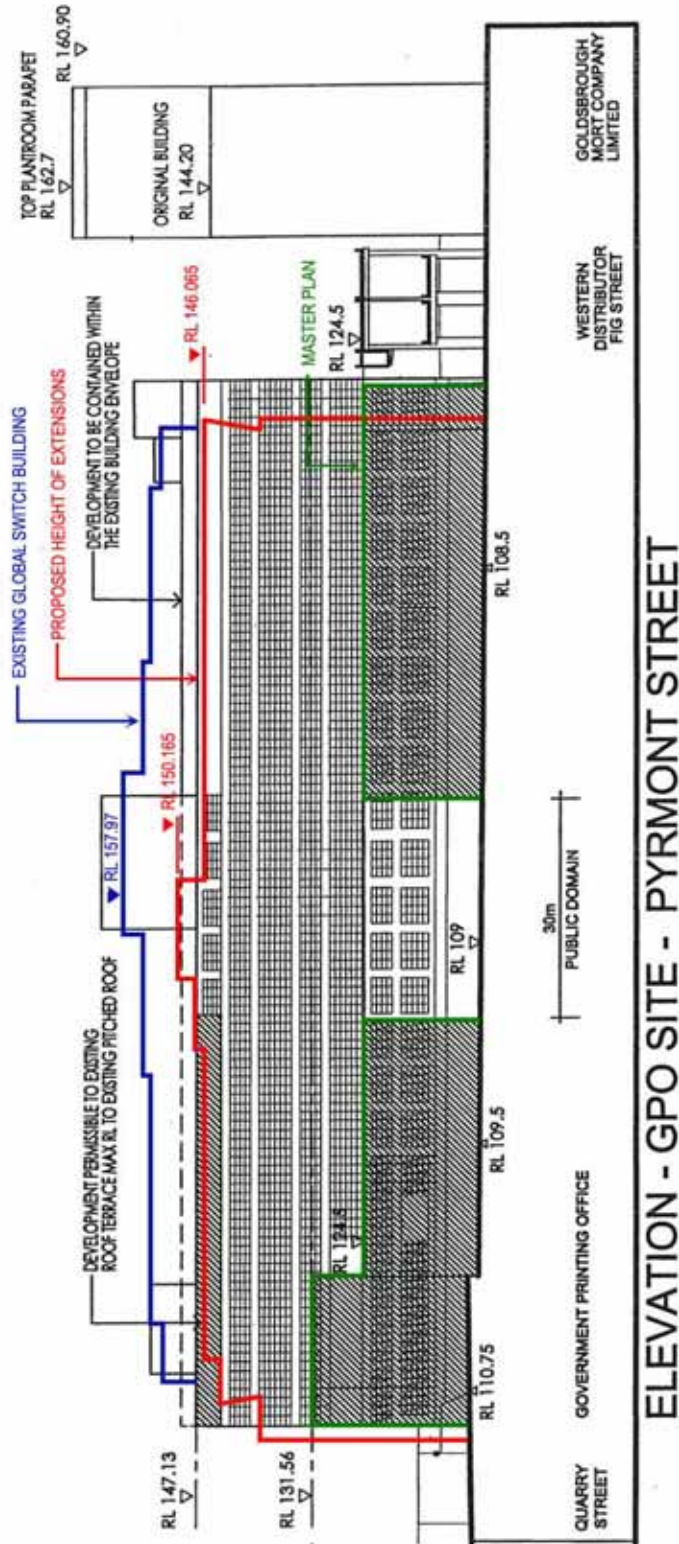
MAXIMUM BUILDING HEIGHTS - GPO SITE
